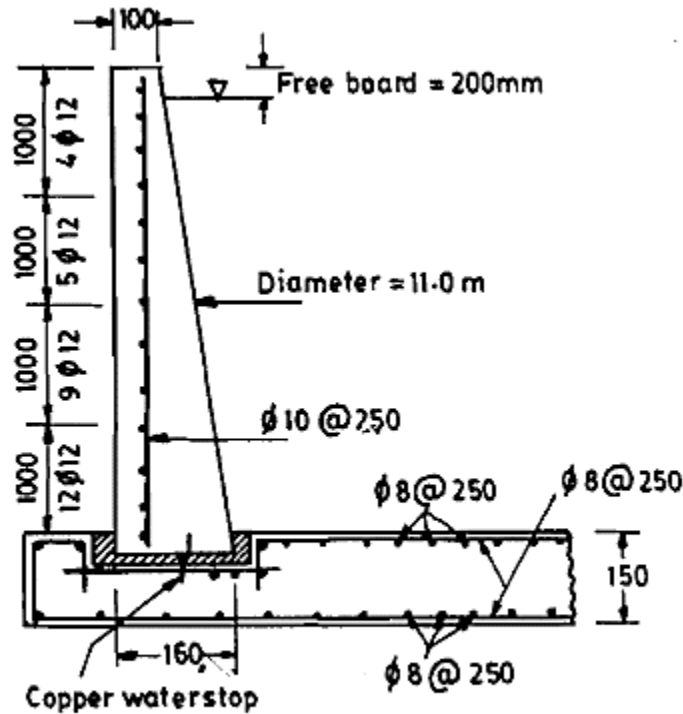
Reinforcement in Tank Wall and Base Slab
